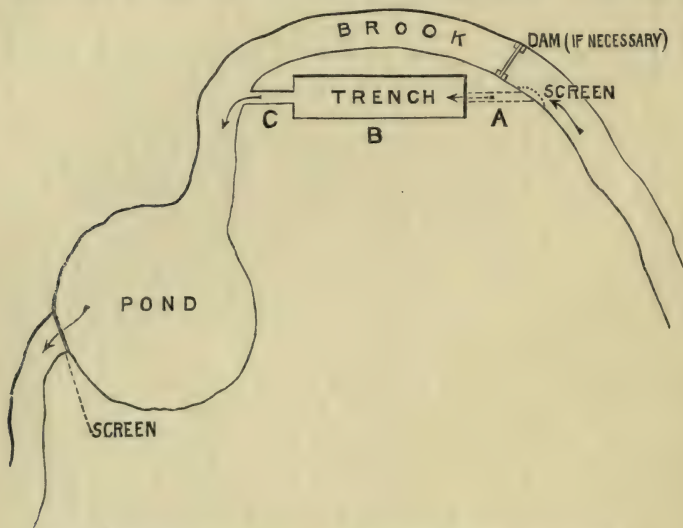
SIMPLE ARRANGEMENT FOR TROUT-BREEDING (Ground Plan).
